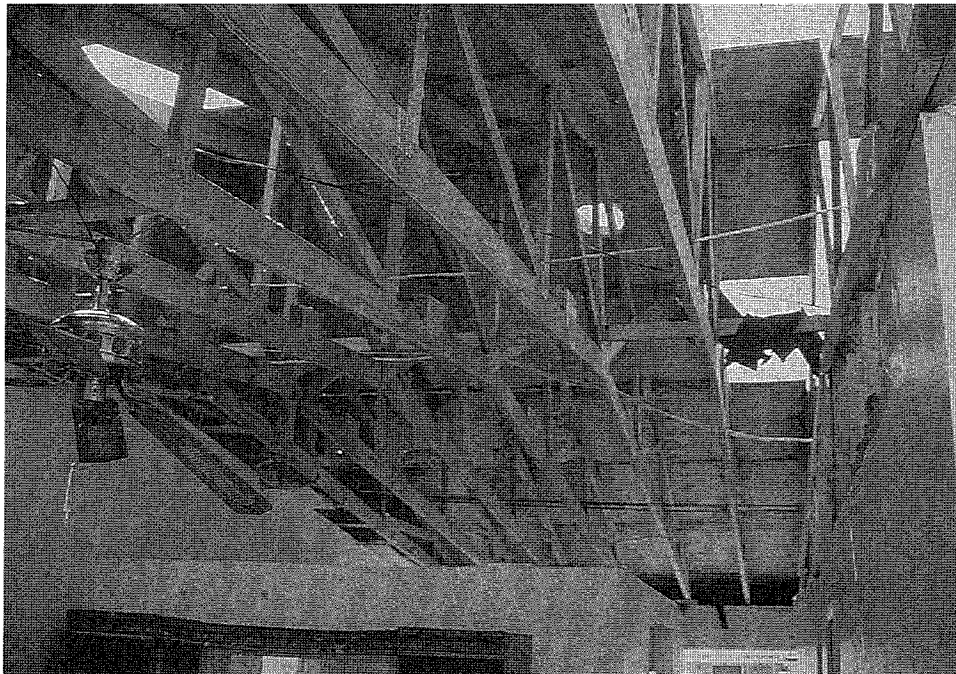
Illustration of a collapsed drywall ceiling from water damage.
